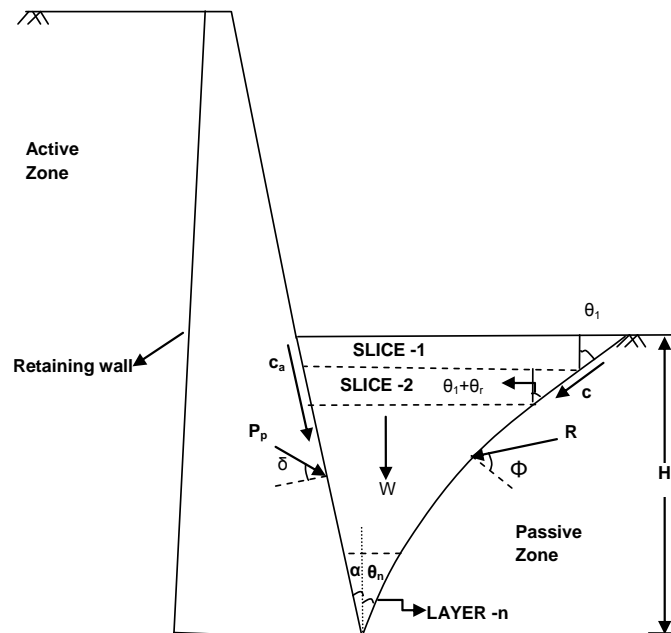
Shows the forces acting battered face retaining wall under passive state of equilibrium
